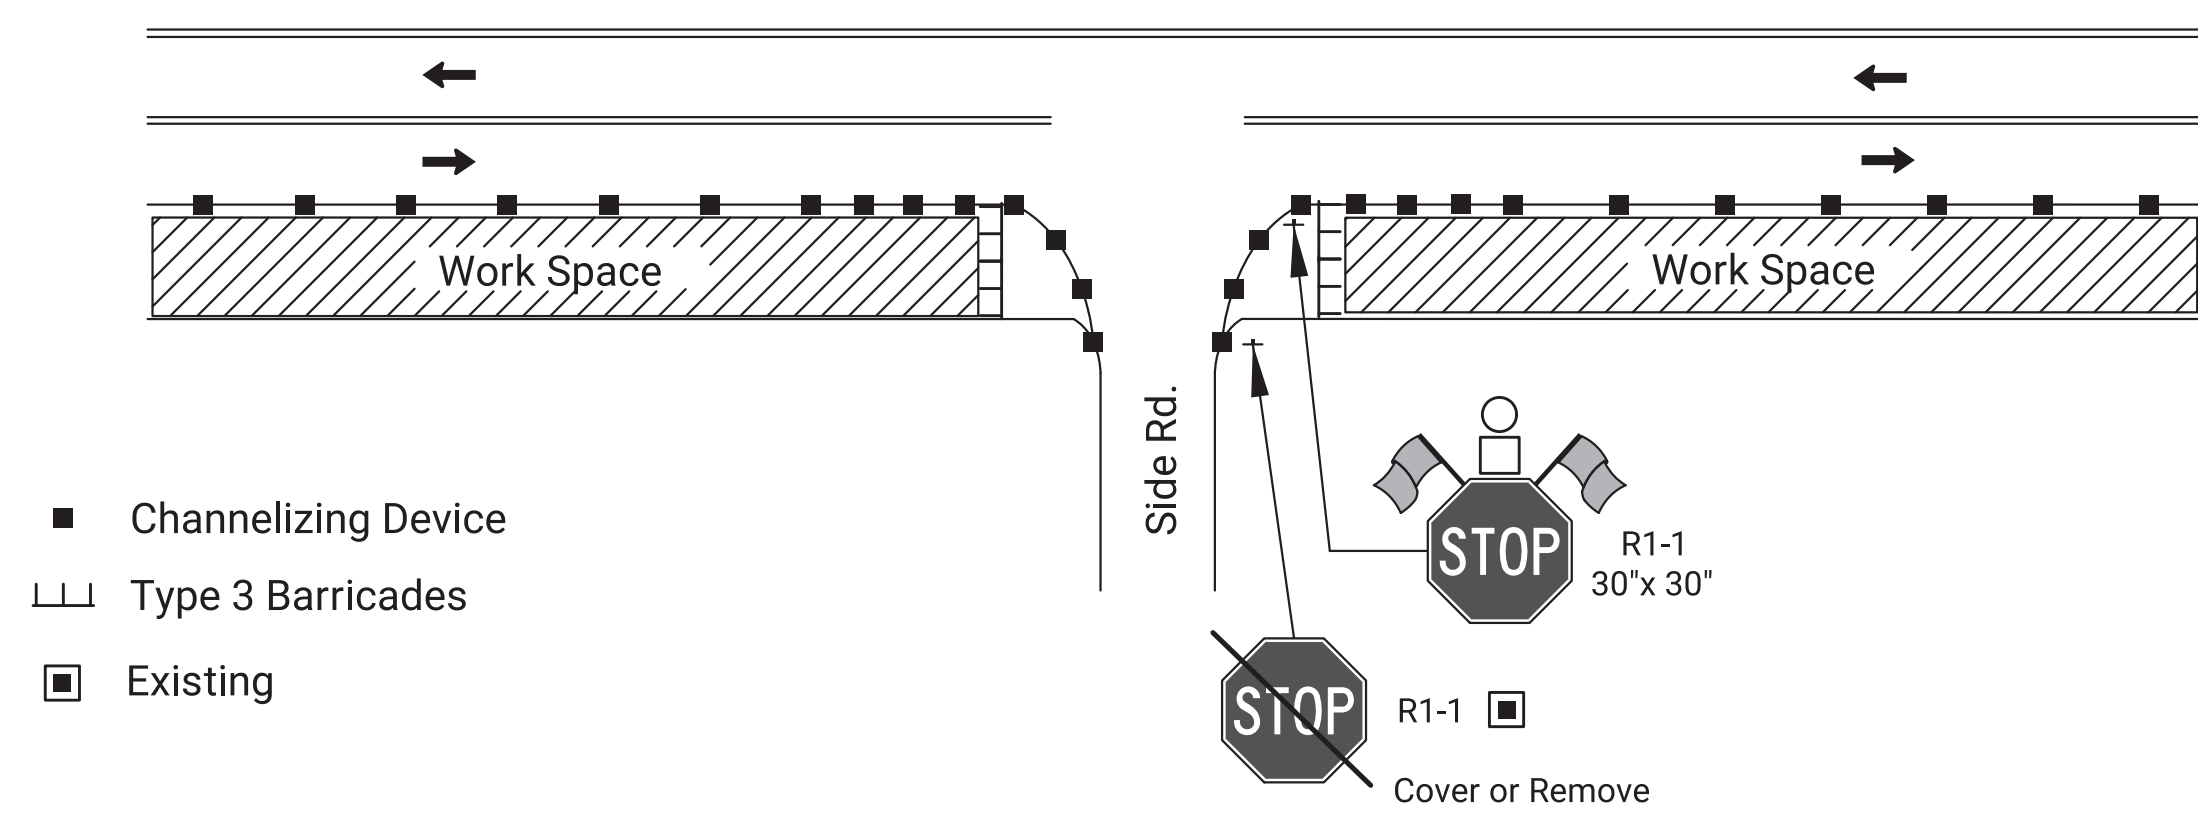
SIDE ROAD OR ENTRANCE OPEN THROUGH WORK AREA
